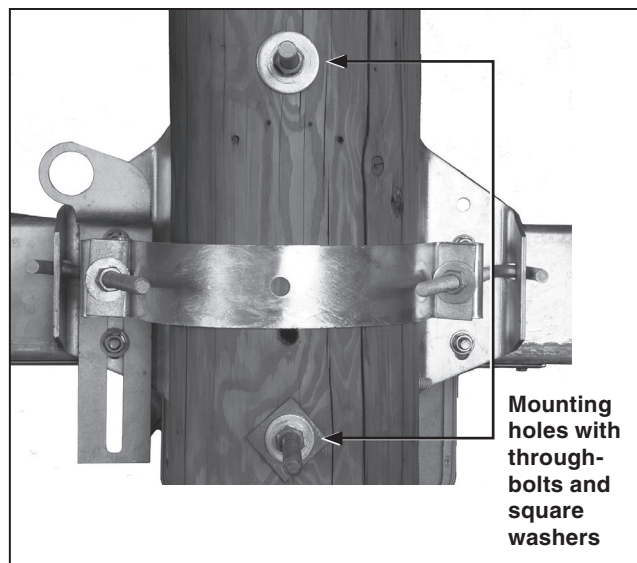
Drill two holes as specified on the catalog drawing. Insert the through-bolts.
